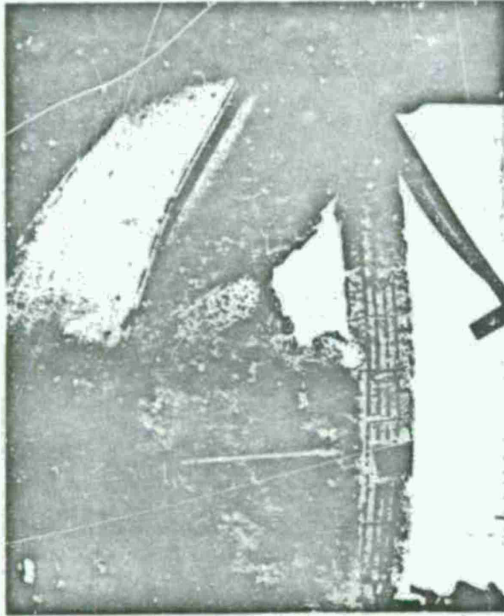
Damaged Headwall Inside Igloo A, East of Door Opening.
